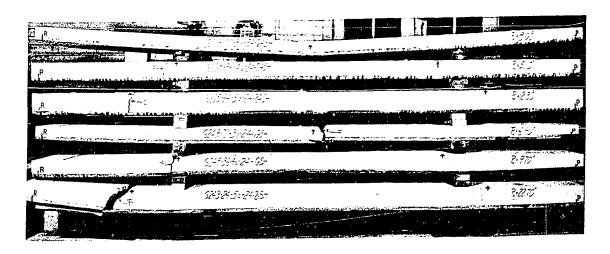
Typical shear-bond and flexure failures of beams constructed with deck G-20 and 24 gage. Each beam was approximately 28 inches wide and 12 feet in length with variable depths
